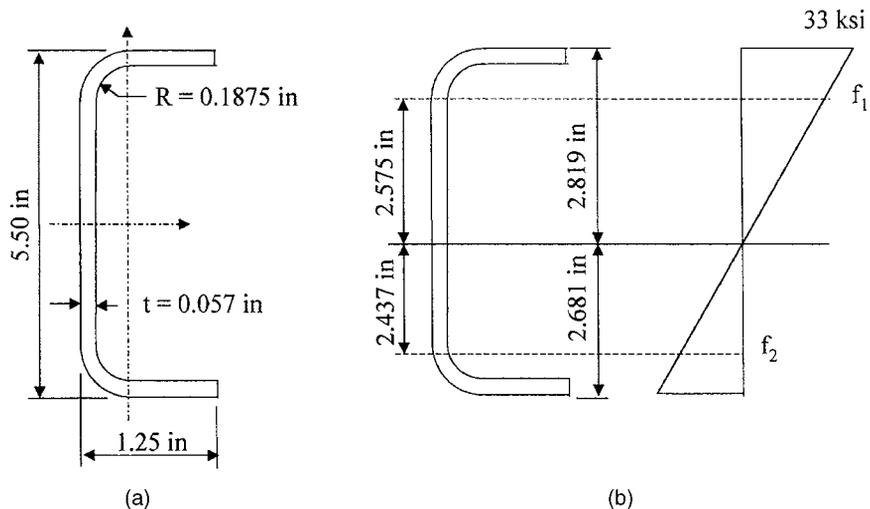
Unstiffened *C* section for example problem (Art. 9.22). (a) Cross section. (b) Stress distribution on effective section.
